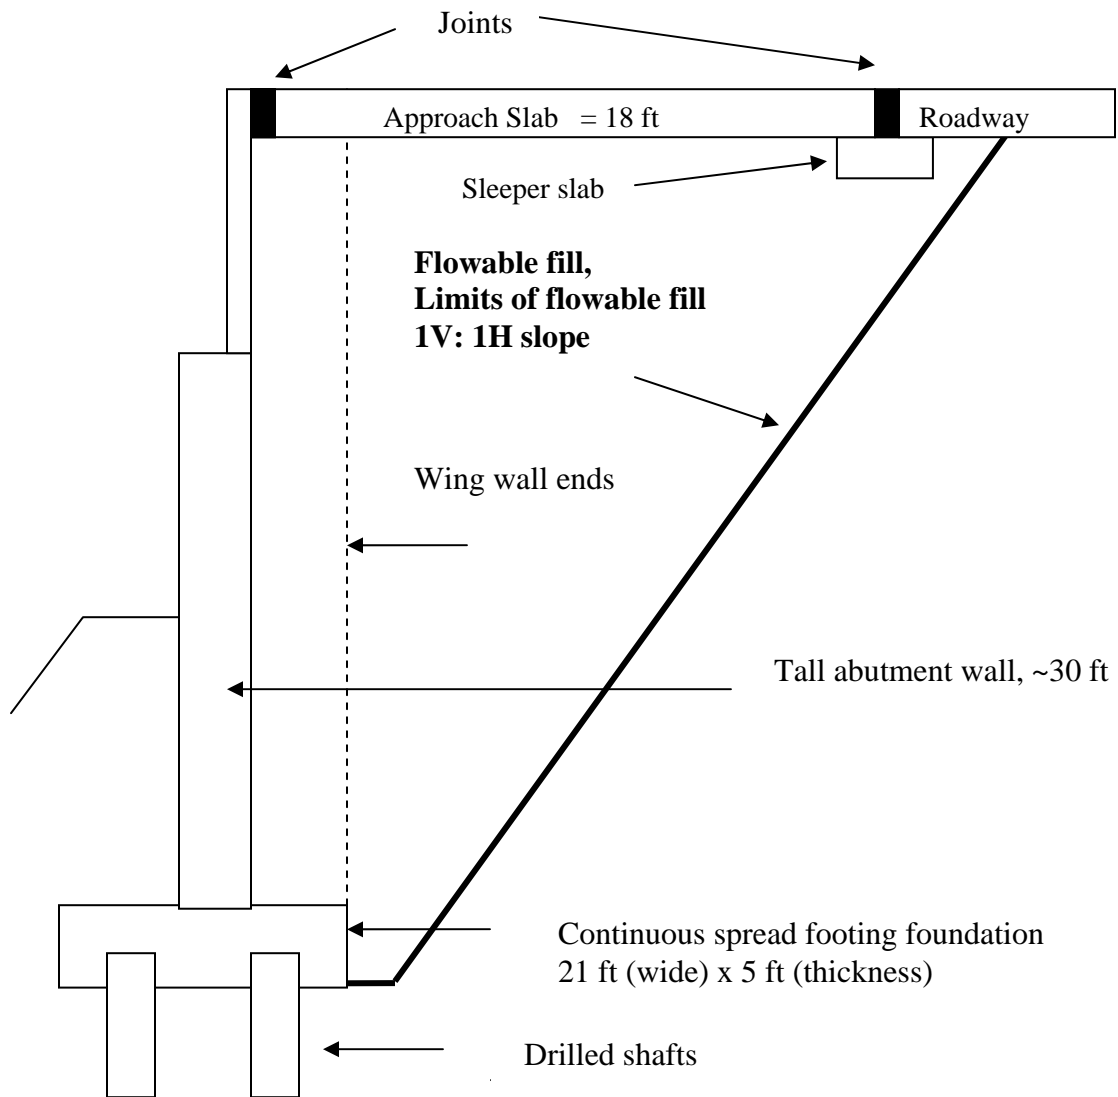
Details of the Eastern Abutment of the WB I-70 to SB I-225 Bridge.
